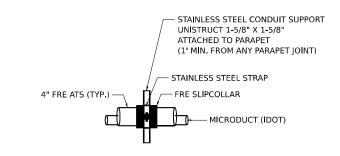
EB OVER GARDNER ST BRIDGE PARAPET CROSS SECTION
